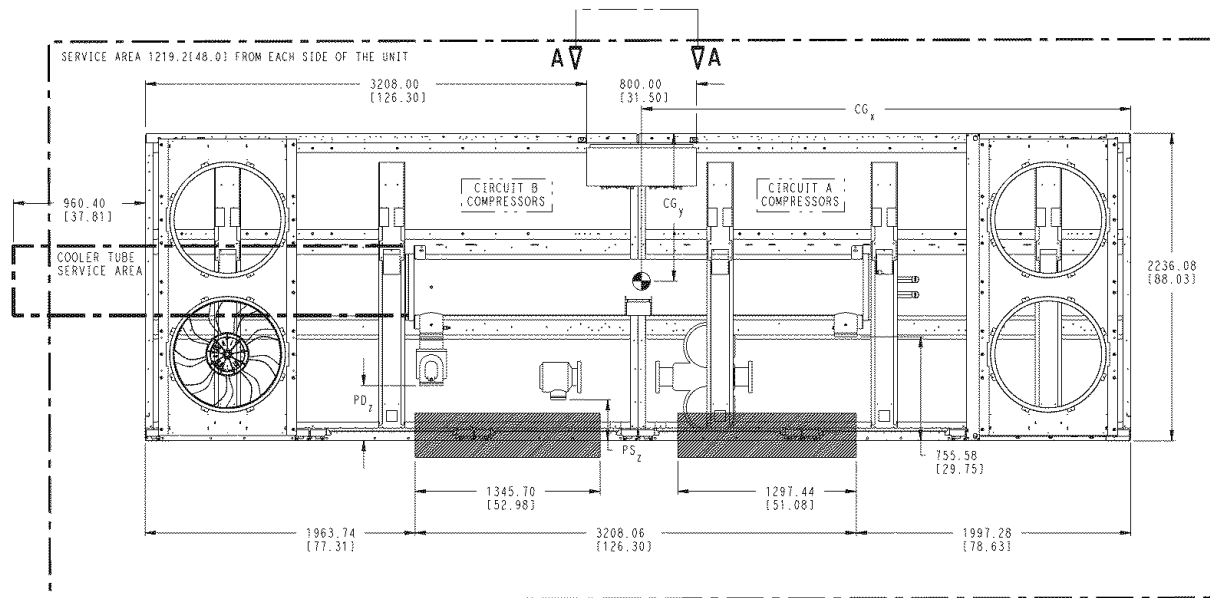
30RB160, 170, 315A/B, 330A/B, 345A/B, 360B Air-Cooled Chiller Dimensions
